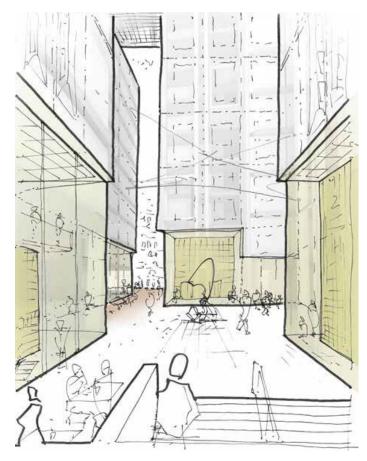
Artist impression of laneways and publicly accessible space from Kent Street stairs
